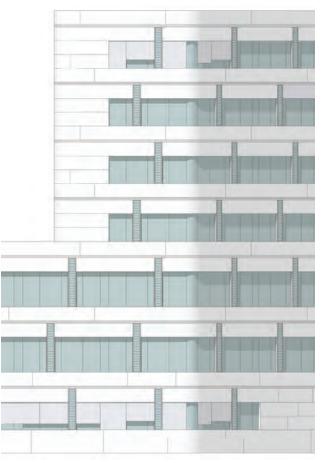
Air Traffic Control Center Langen, detail elevation (Source: Arup) 图3. 兰根空中交通管制中心立面详图(来源: Arup)
